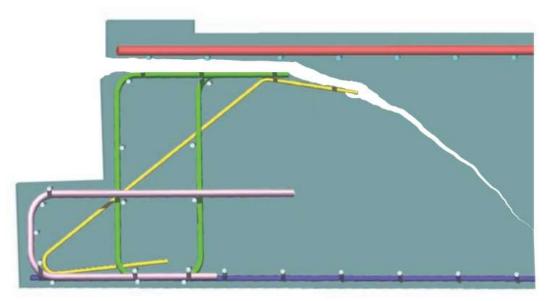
The crack that occurred at the cantilever portion of de la Concorde Bridge (taken from [5] and edited to show the crack)
